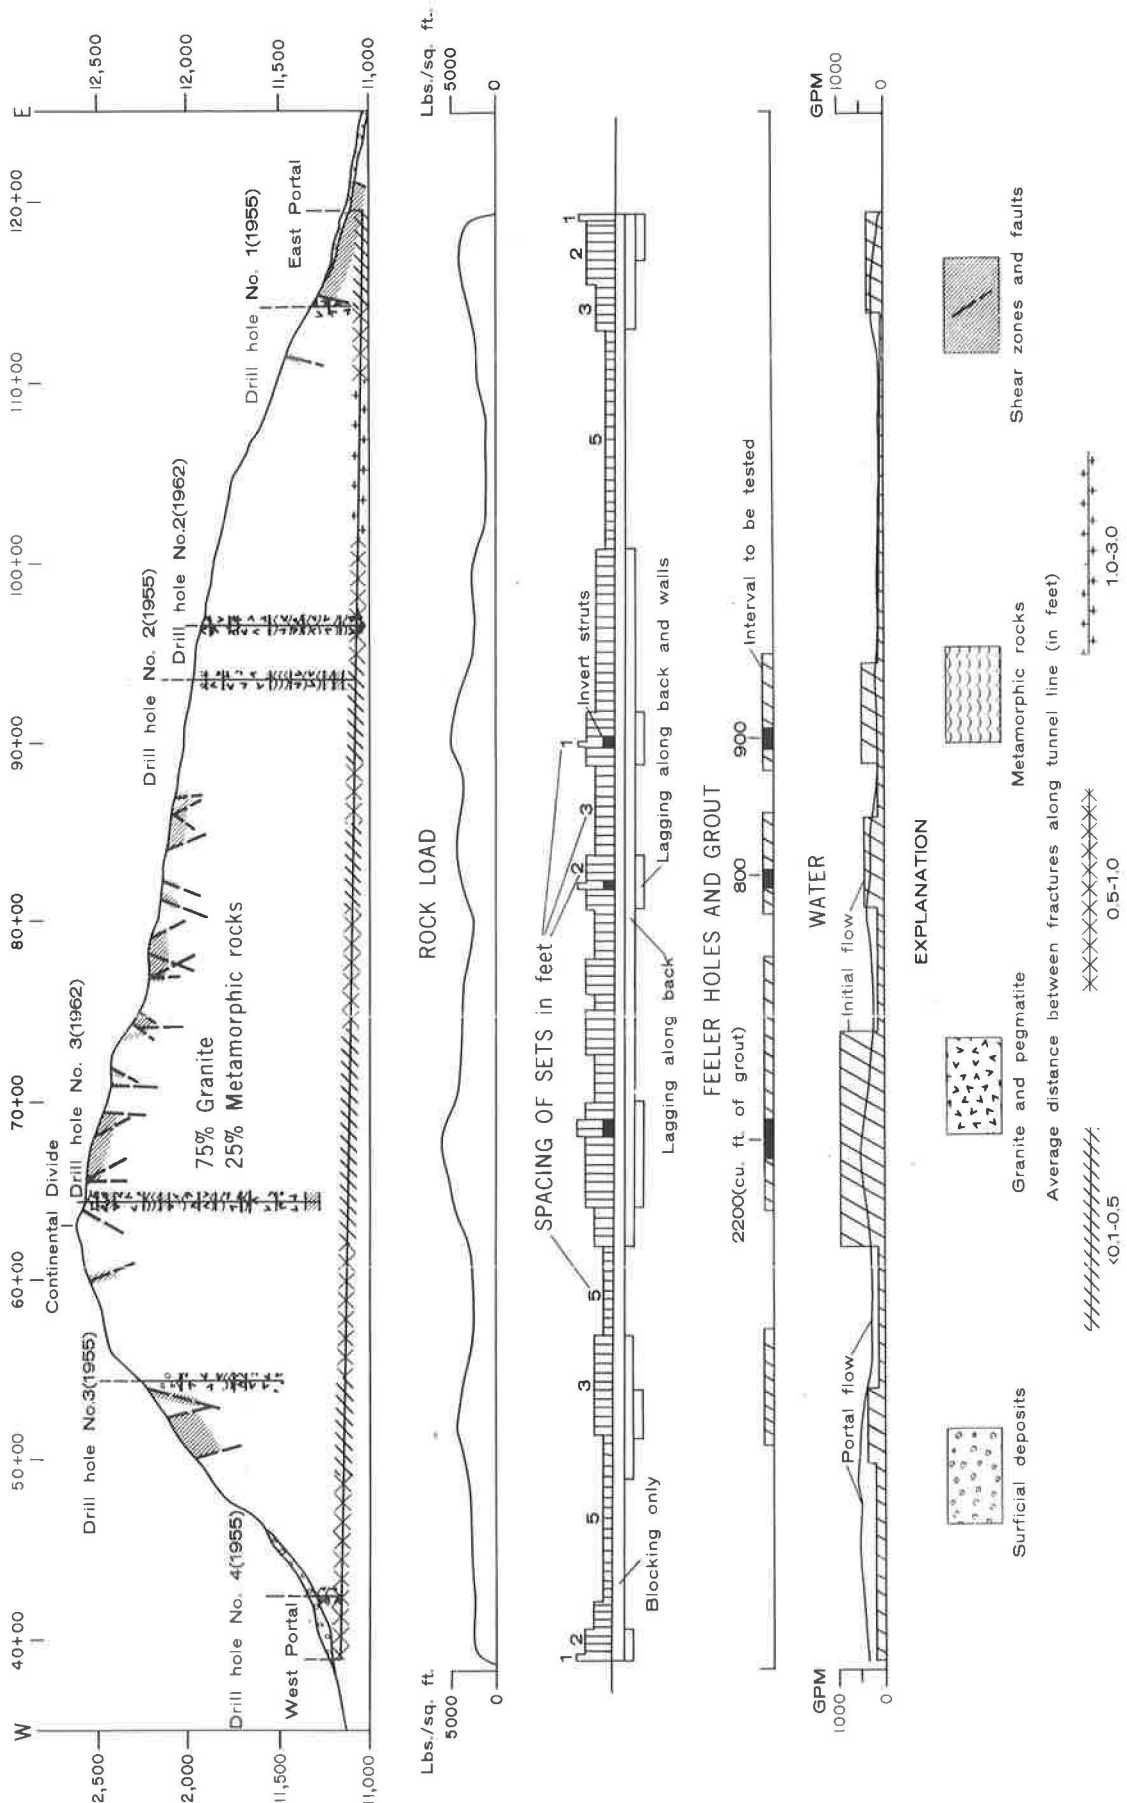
Predicted geologic section and engineering data along proposed straight tunnel pilot bore.
